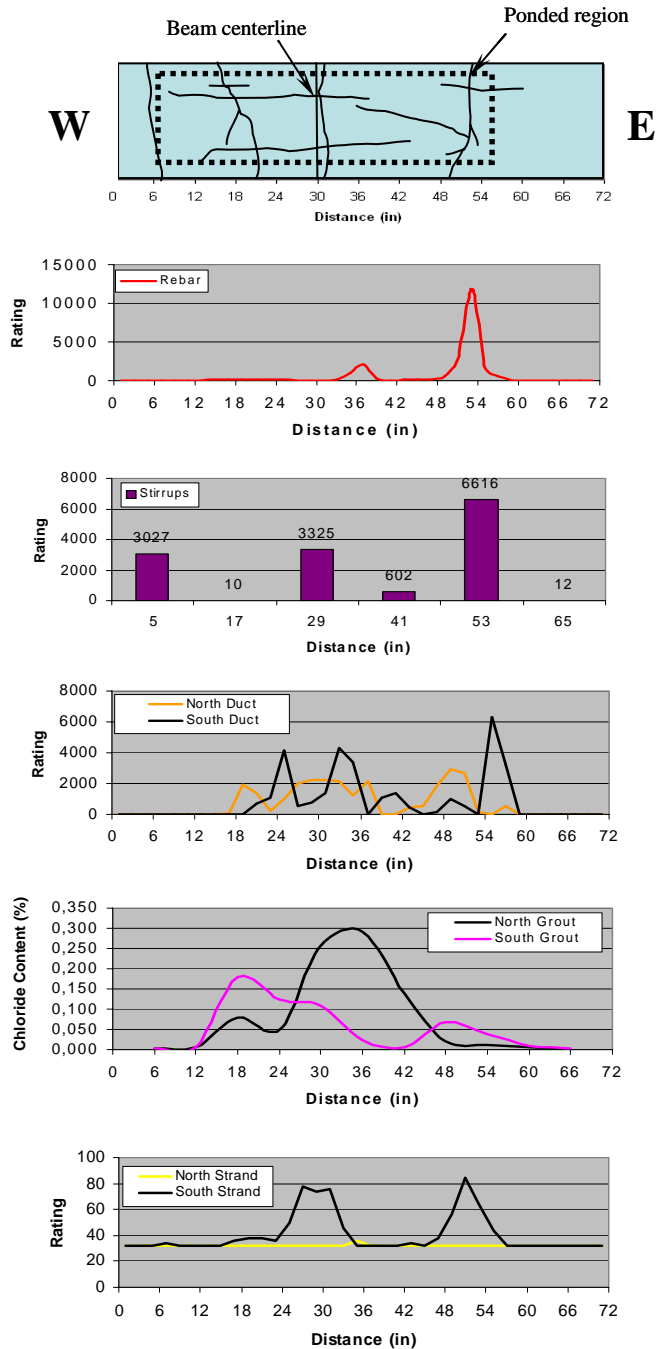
Specimen 2.3 – Reinforcing Elements<sup>6,7</sup>
